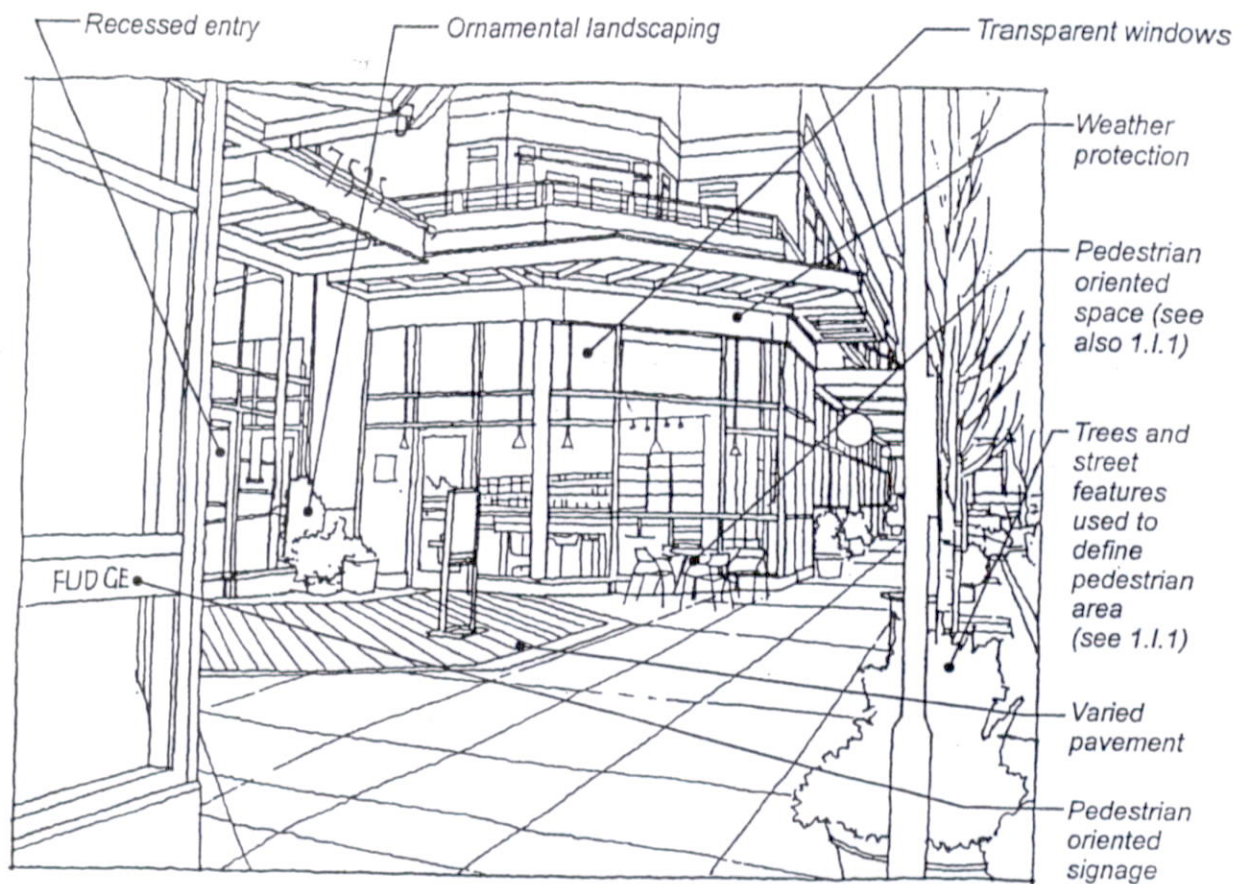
D.1: Pedestrian-friendly ground floor facades keep “eyes on the street” and add interest and life to the streetscape
